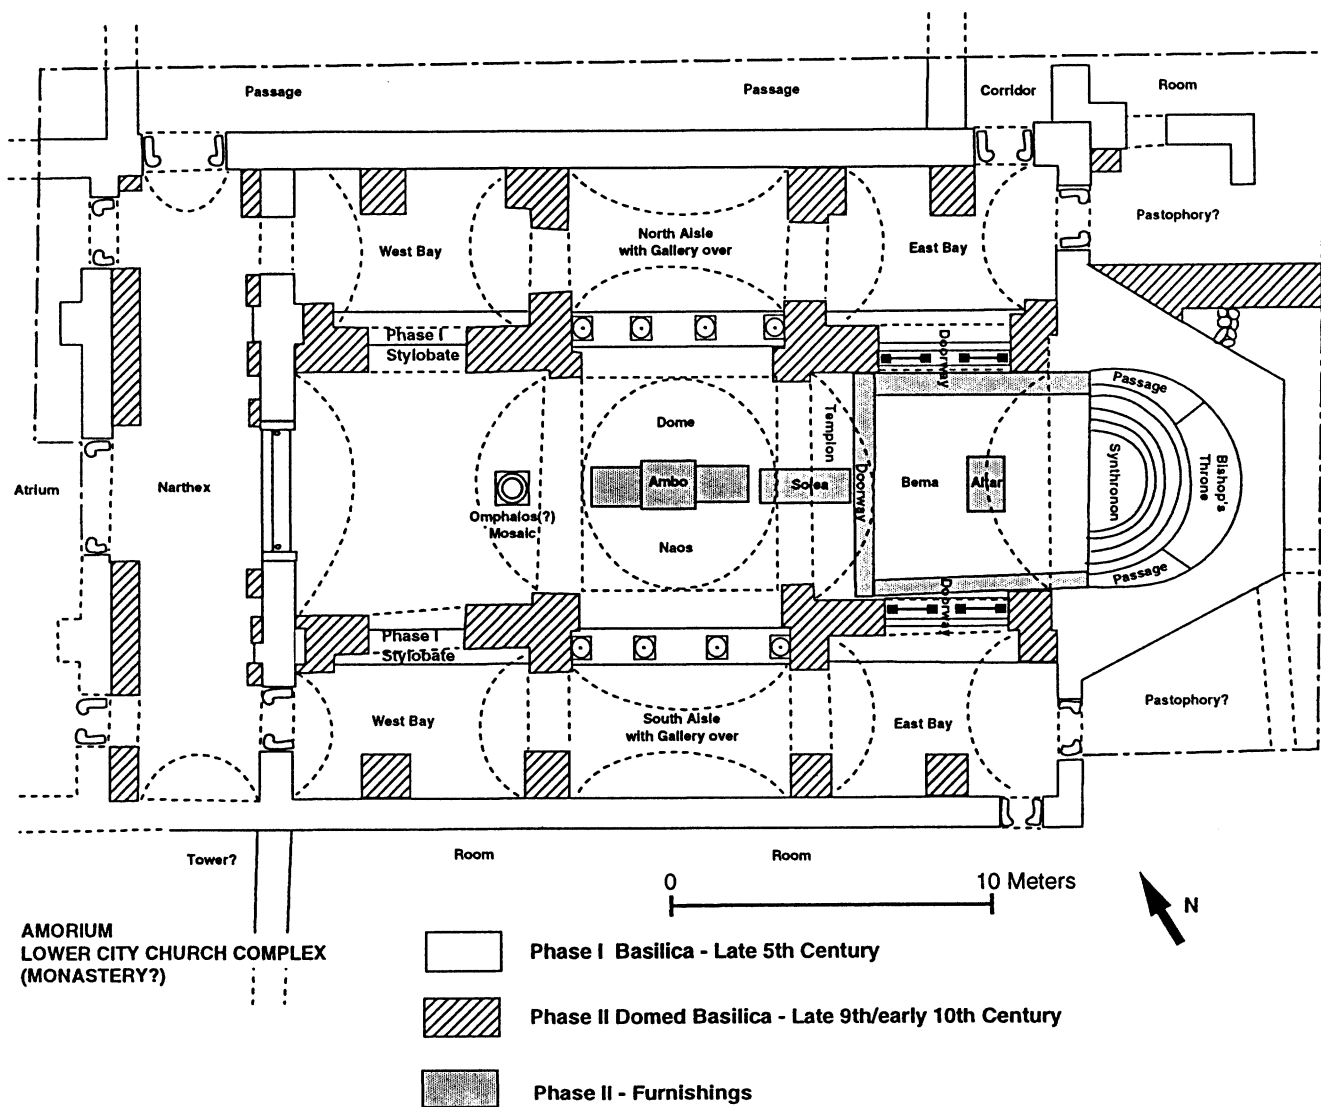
Fig. B Sketch plan of Lower City church (drawing by A. Darling and E. Ivison)
